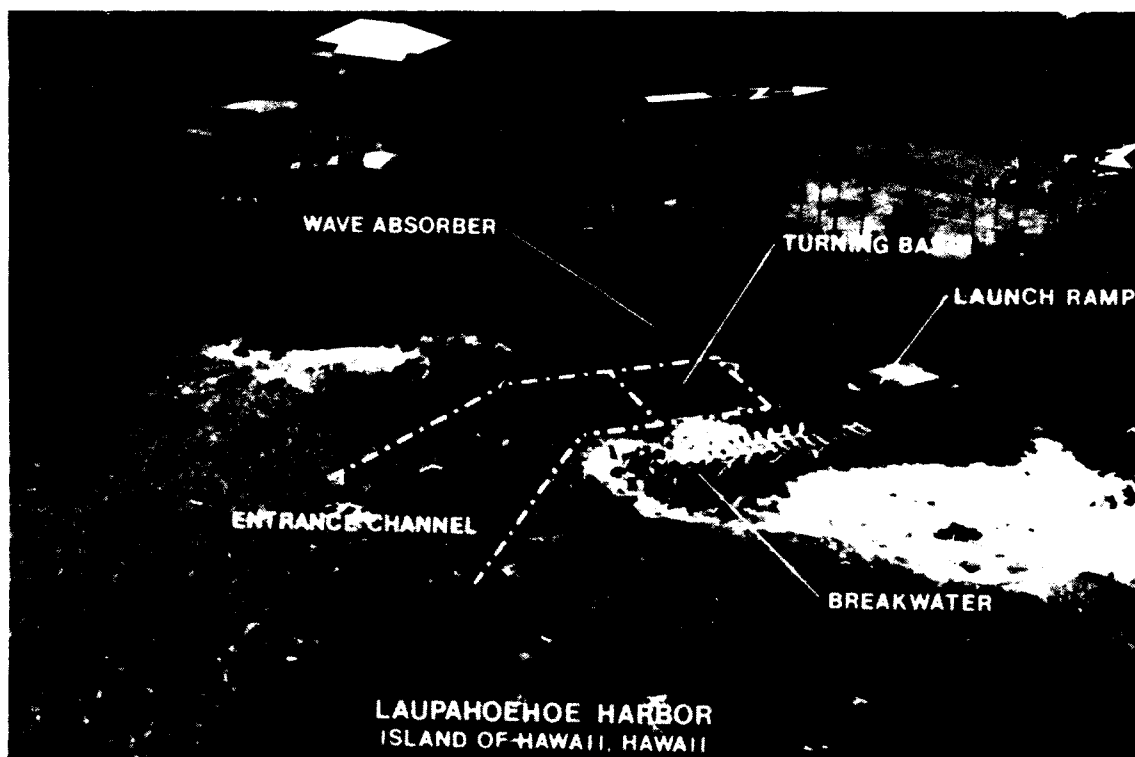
Laupahoehoe Boat Launching Facility, Hawaii
